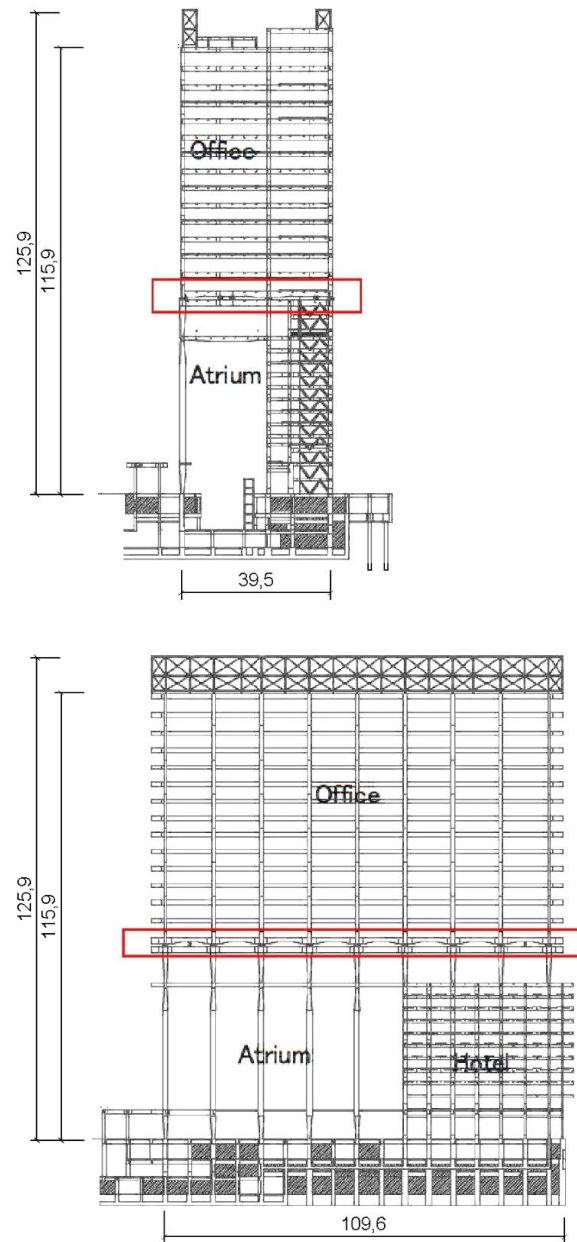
Shiodome Sumitomo building: Sections (a) transversal, (b) Longitudinal, (dimension in meters) [Sueoka et al. 2004]
